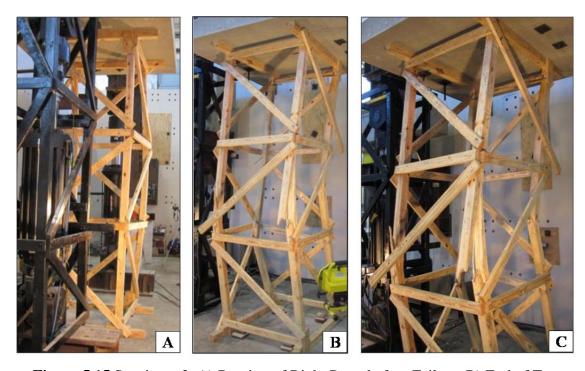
Specimen 3 A) Bowing of Right Posts before Failure B) End of Test Condition C) Close-up of All Four Post Failures
